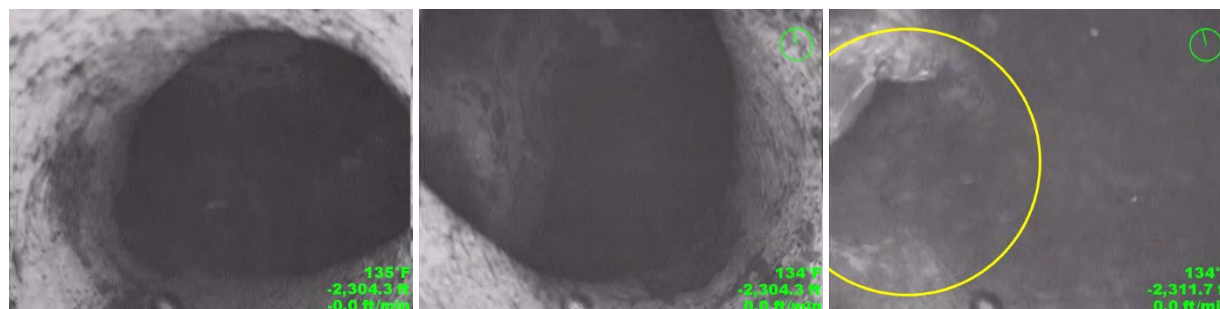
Camera survey showing deformed casing, left two photos, and hole, right photo.
